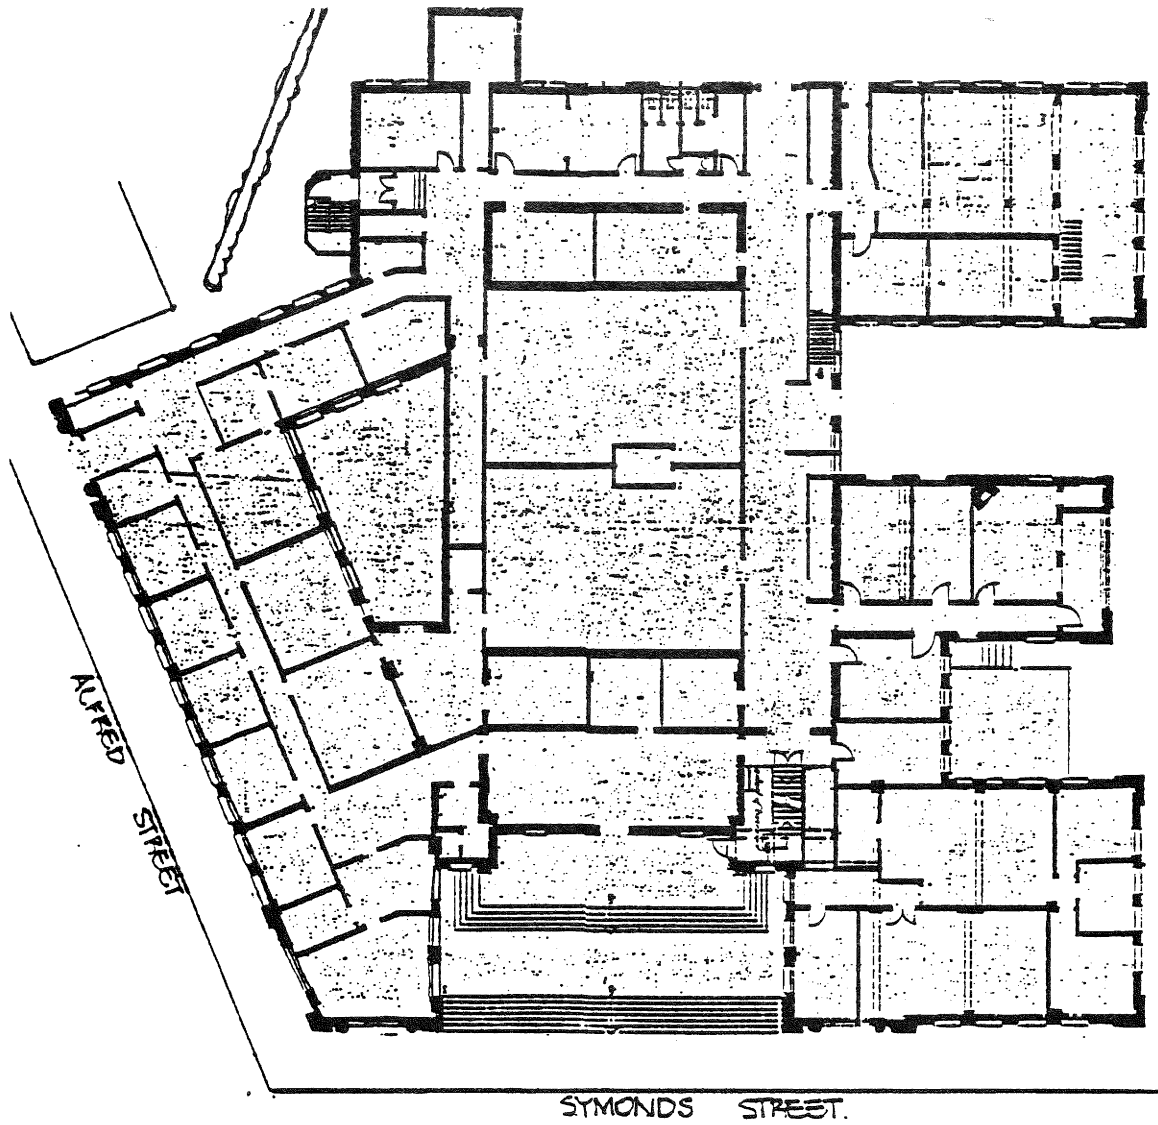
OLD CHORAL HALL – GROUND FLOOR
